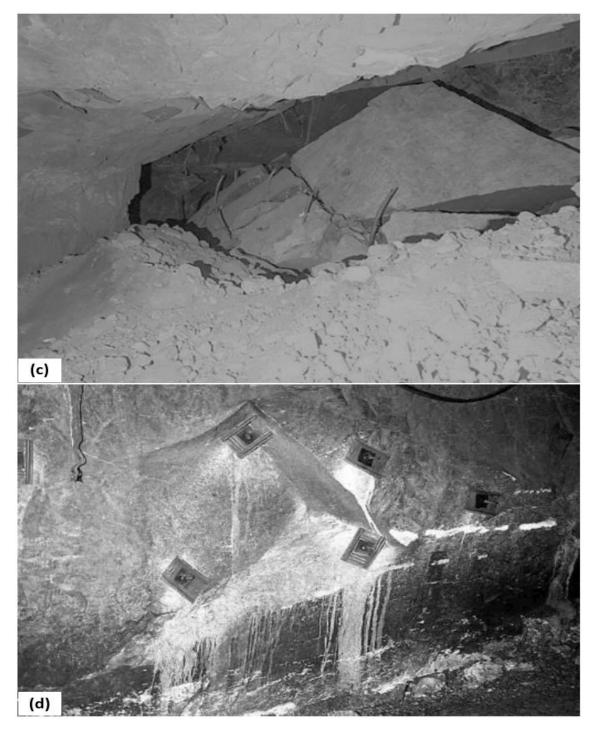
Structural failures: (c) block fall, (d) wedge failure
